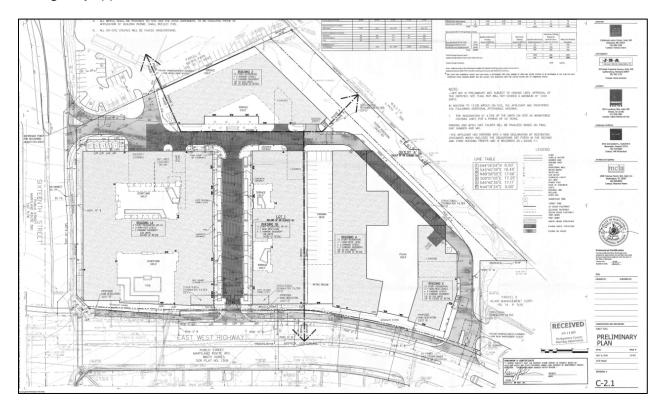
Approved Preliminary Plan Amendment 12007056A
